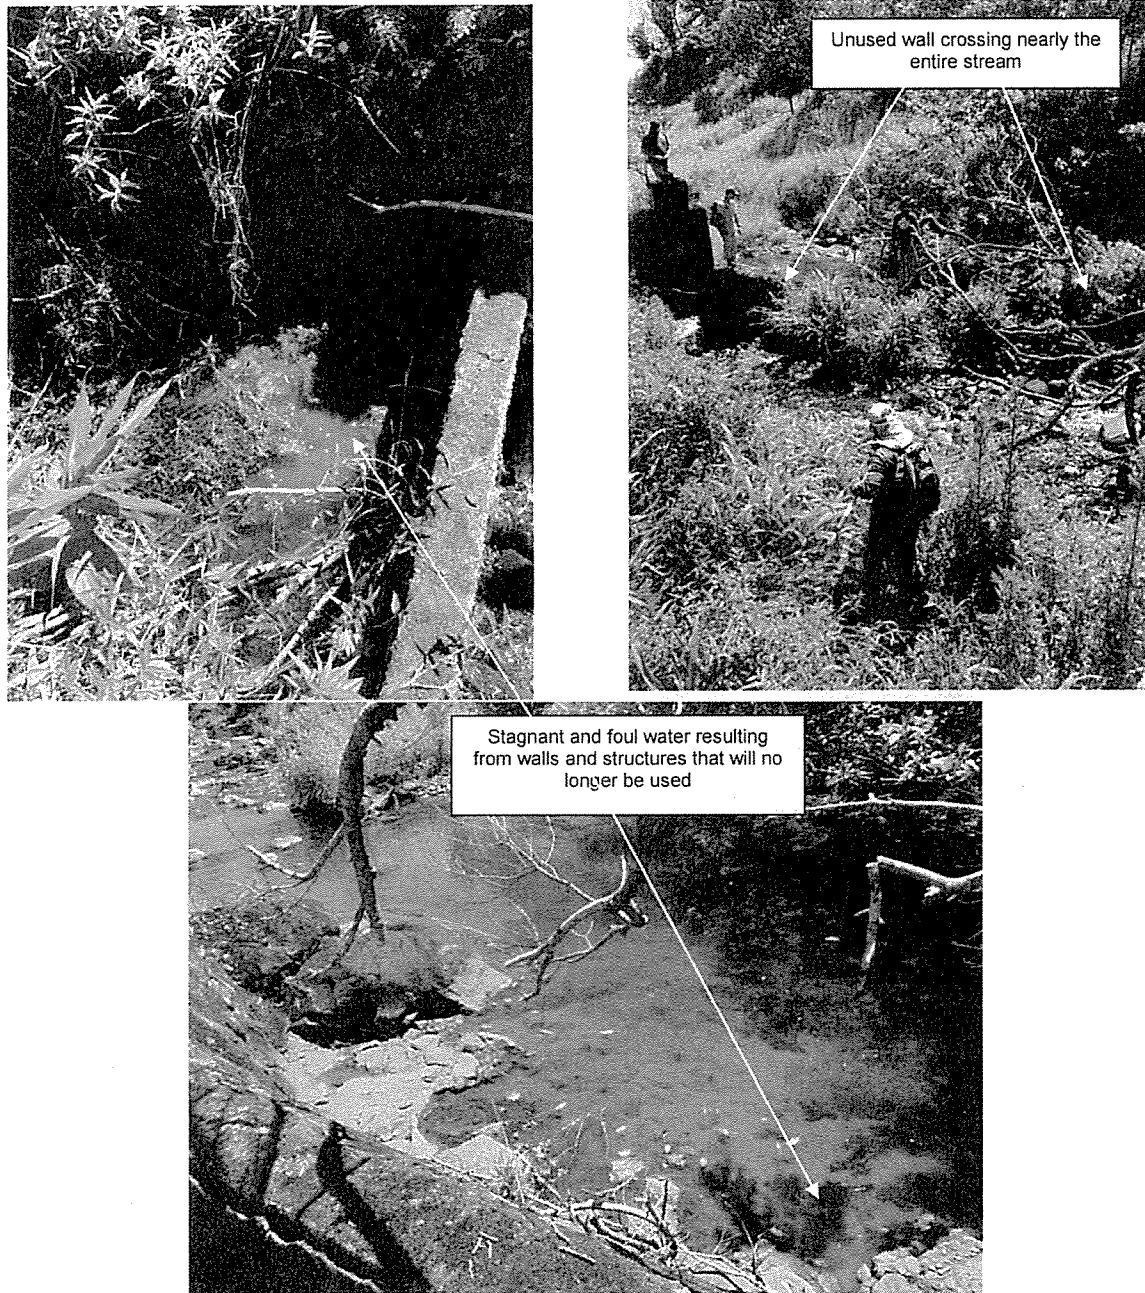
East Wailuanui at Koolau ditch (K-18). Stagnant water outside the west wall (top left), wall crossing stream (top right), stagnant water on the east side of the stream.
